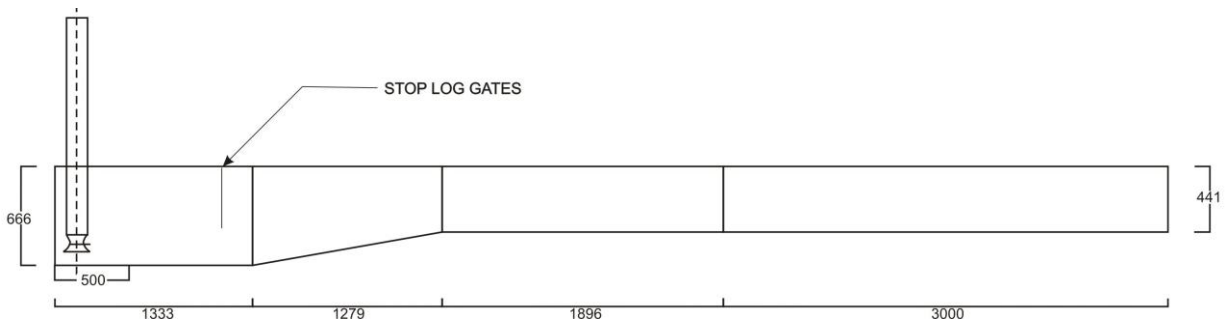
Sectional view of the pump intakes-CFD model (all dimensions in mm)
